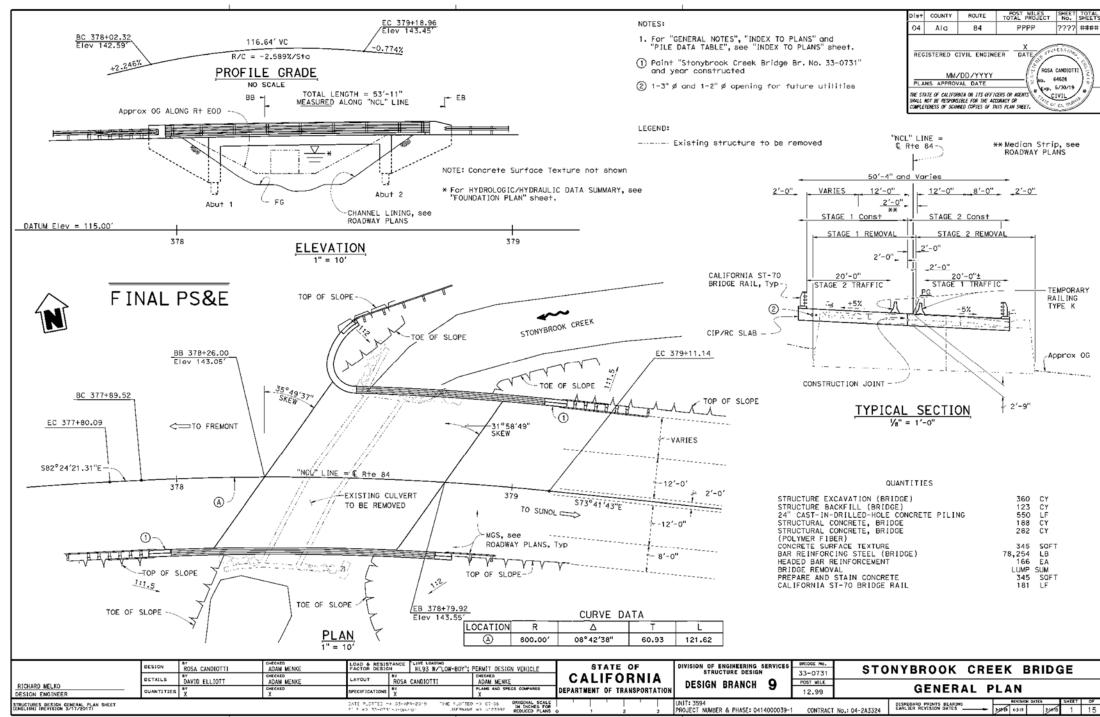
Proposed Stonybrook Creek Bridge General Plan
